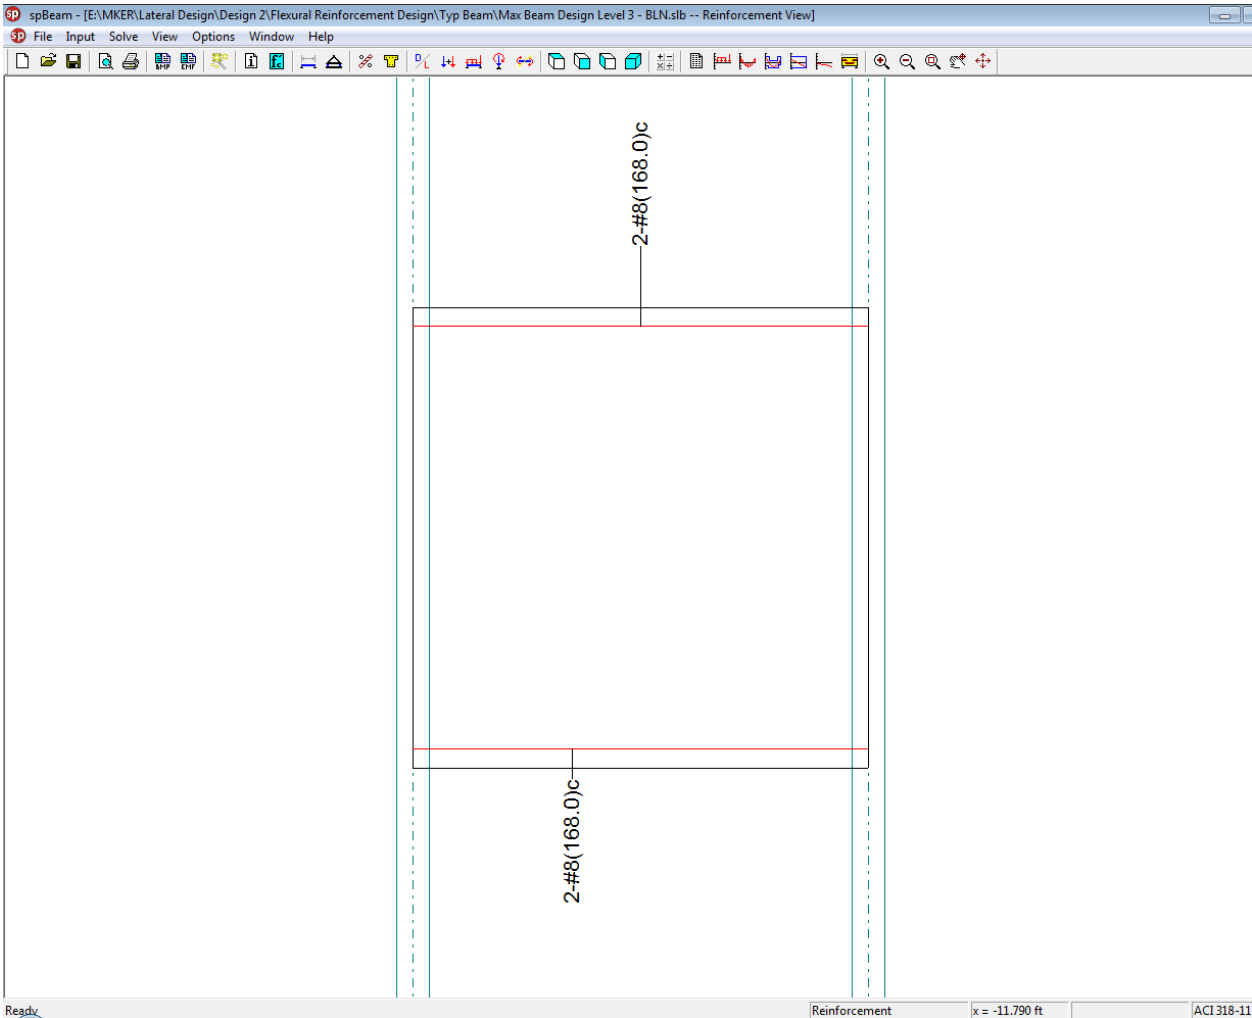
, spBeam Flexural Reinforcement Design of BLN Lvl. 3
